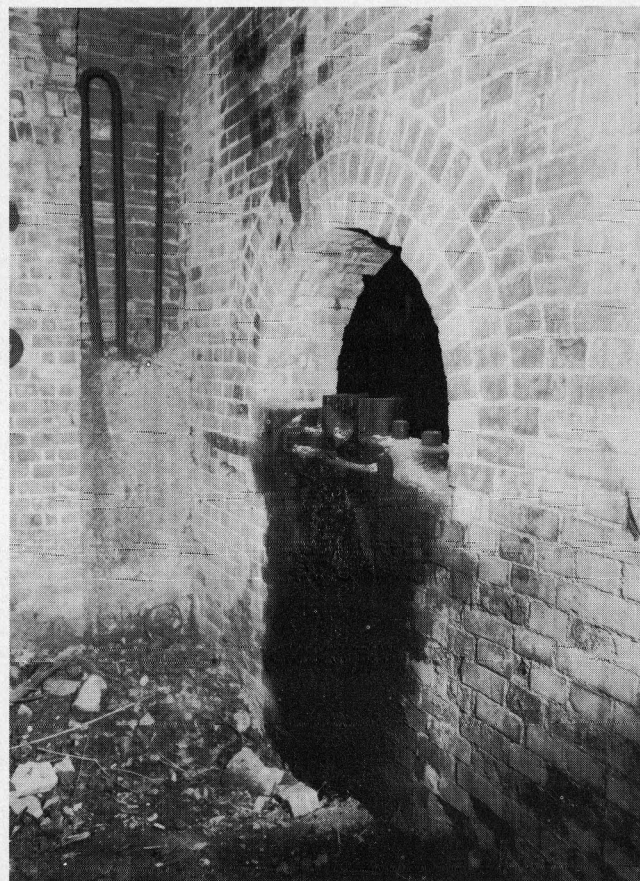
The opening between Chambers I and J which originally housed part of the line-shaft (see Fig. 19)
